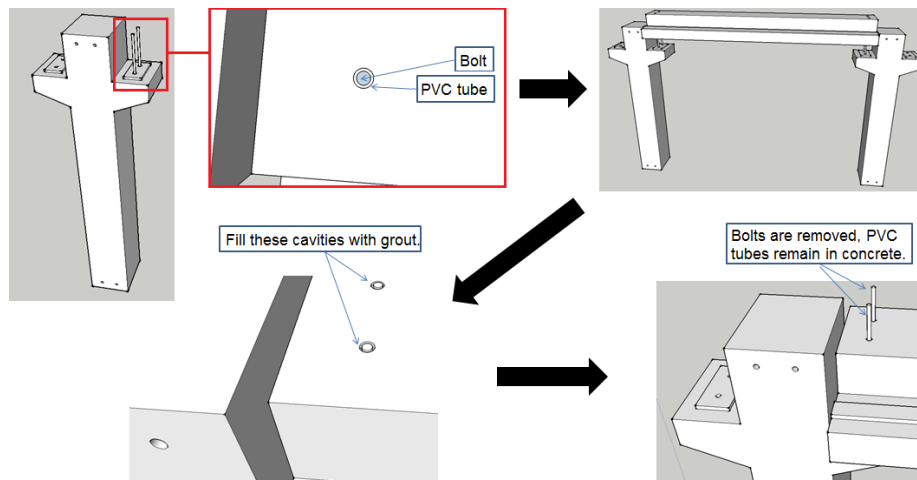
Four steps for connecting and disconnecting a beam to a column using the DEMU system.
